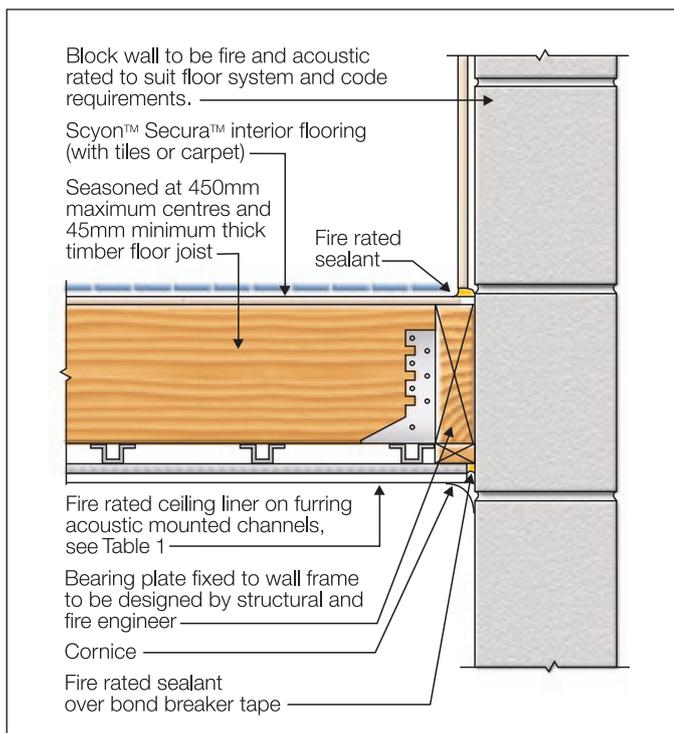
FLOOR TO MASONRY WALL JUNCTION - OPTION 3
